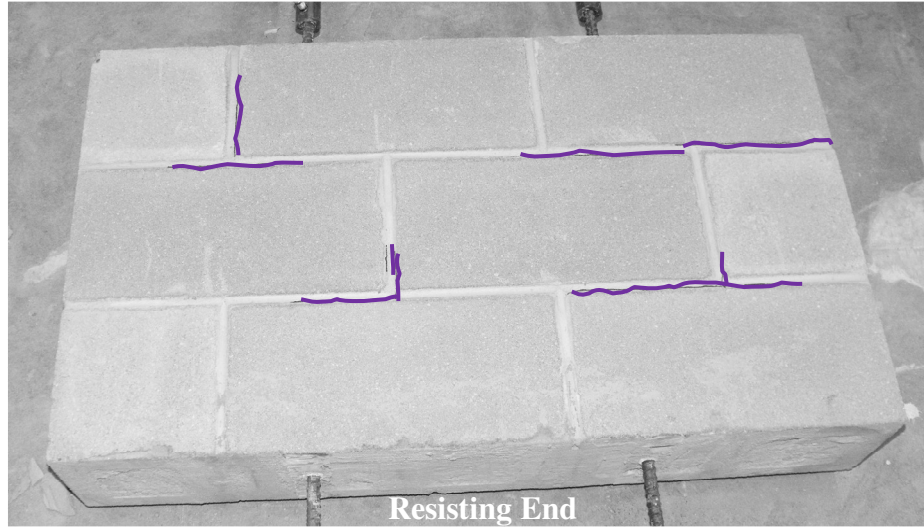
Typical surface crack propagation in a double pullout specimen with contact lap splices – Specimen CP-6.
